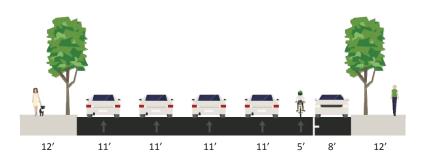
Florida Avenue Typical Cross-Section, between Madison Street and Twiggs Street
